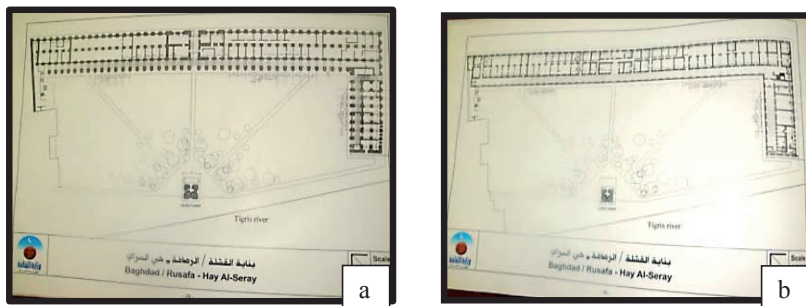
plan of Qishla building, a- ground floor, b- first floor [13]
